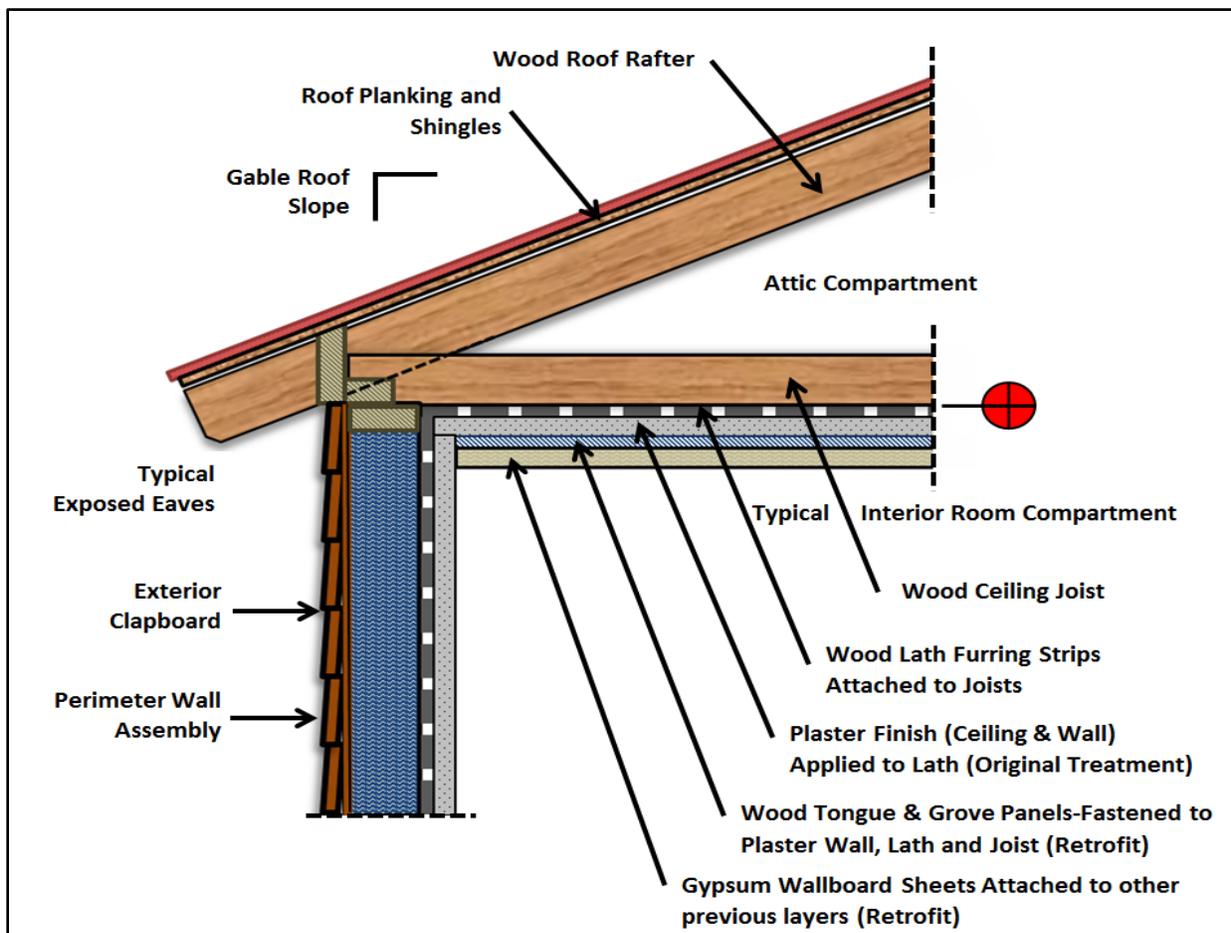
Typical Roof-Ceiling Assemblies with Ceiling Retrofits
